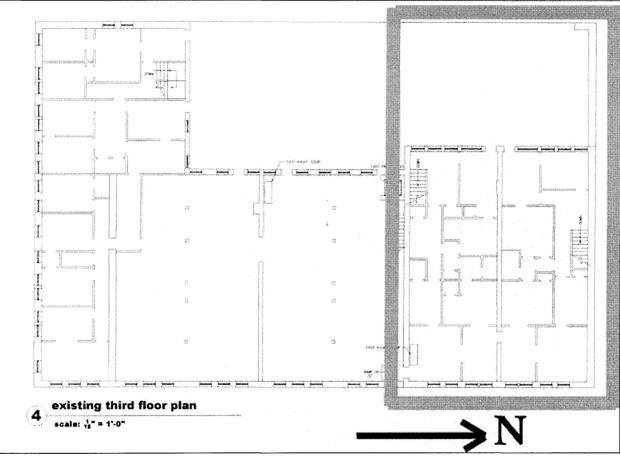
Existing third floor plan (the Ziepprecht Building is highlighted)
